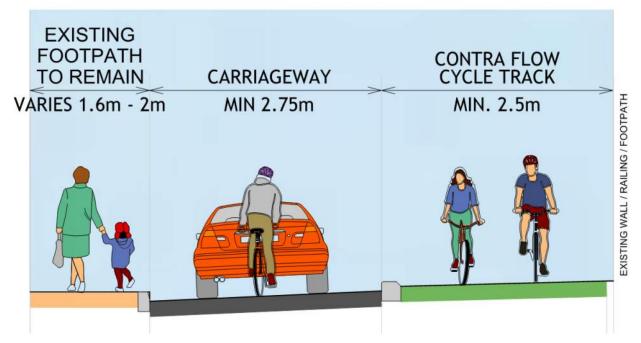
Typical Section 3 Option B Cross Section SCR - Contra Flow Cycle Track between Fennessy's Roundabout and Laurel Hill Ave
